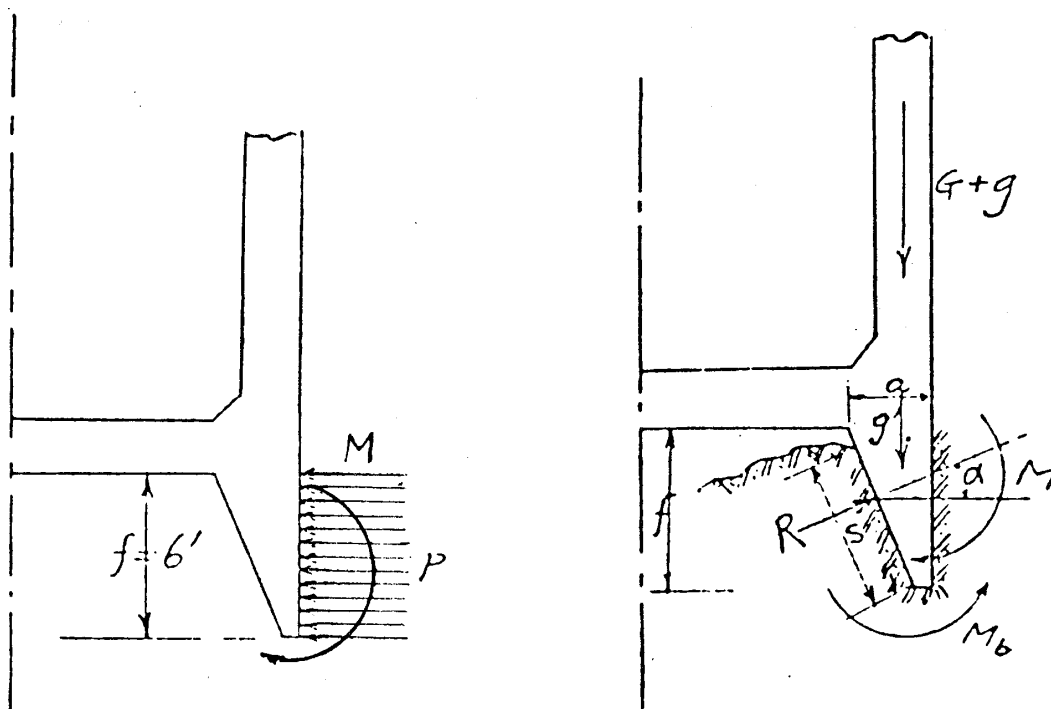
Showing Actual Pressure of Cutting Edge as for Design of Caisson Foundation Kiso and Ibi Railway Bridge
